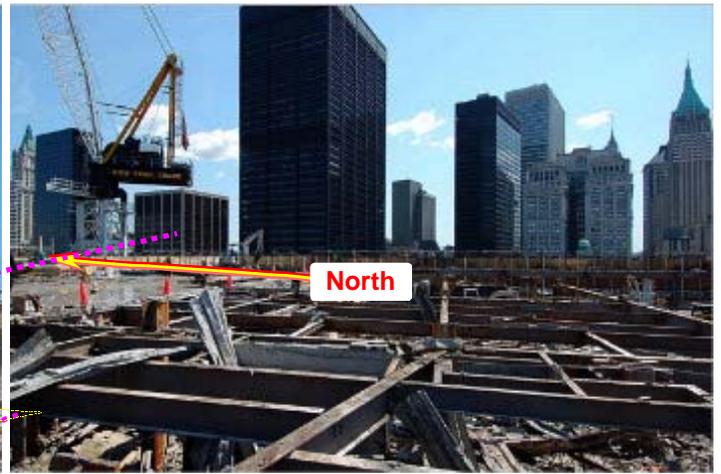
Once the concrete slab and metal decking are removed, what remains is a steel skeleton of each floor. There is little rust in the southwest corner of the building, even though it is open during the deconstruction from the top down.
